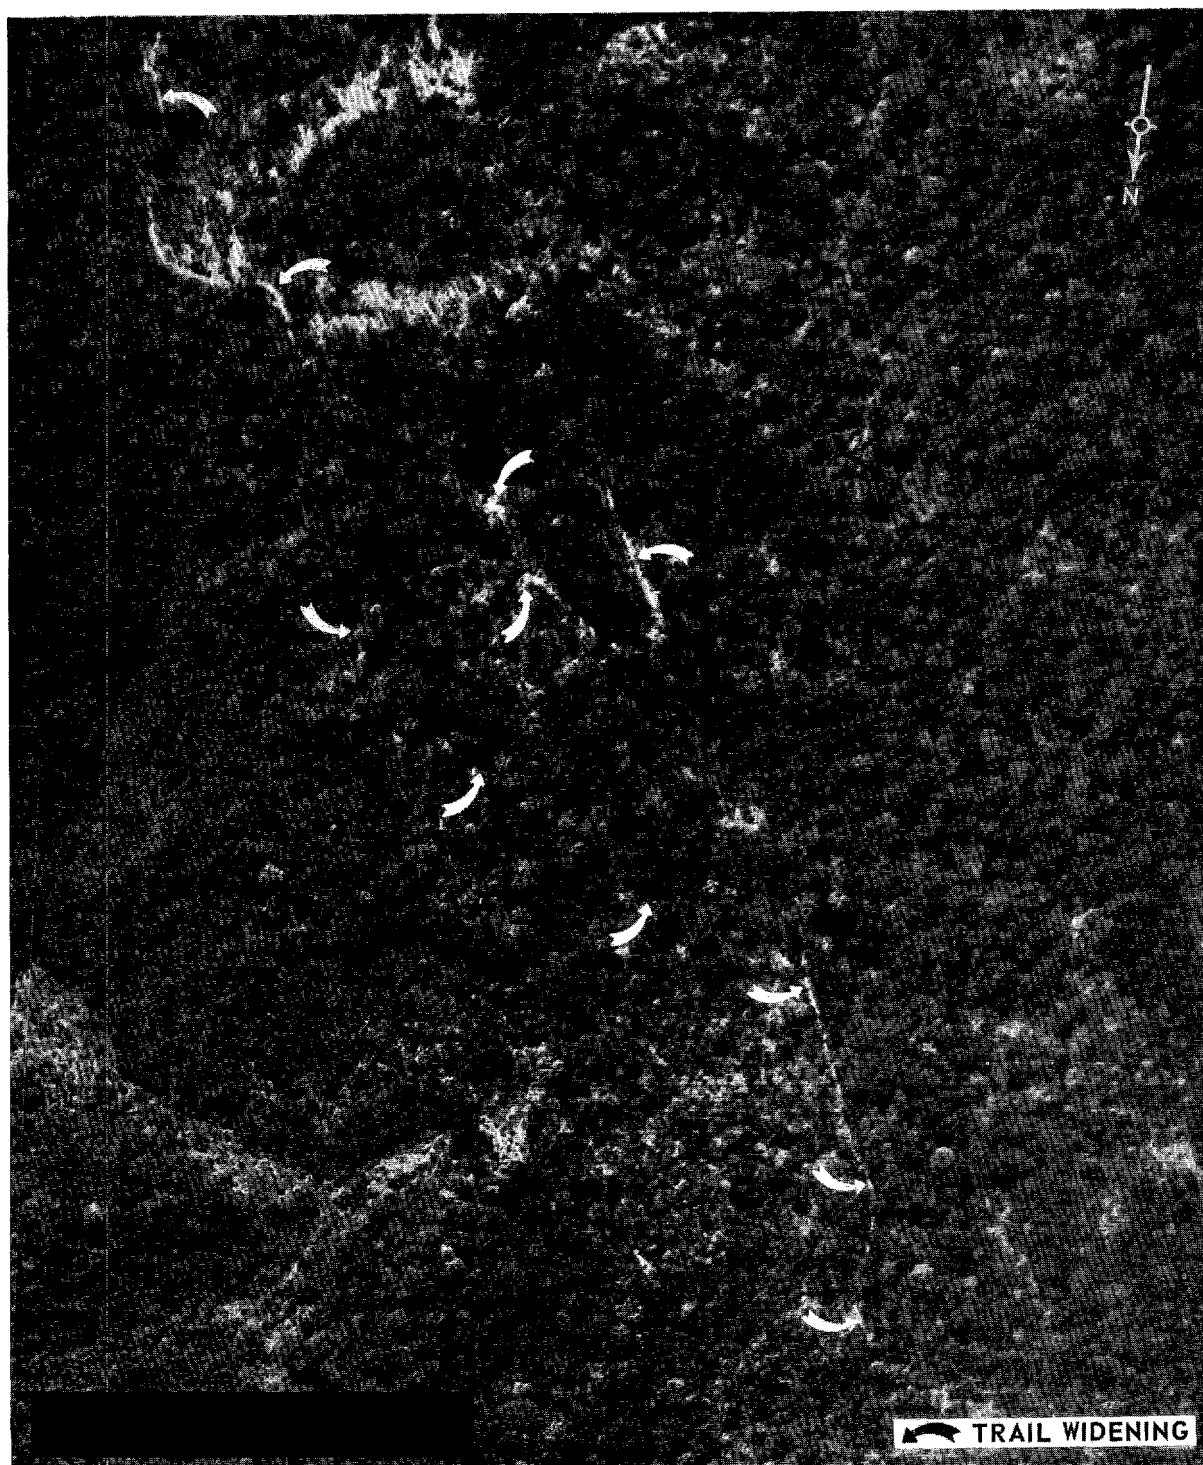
ROAD RECONSTRUCTION (14-43N 107-10E), ROUTE 16, LAOS
